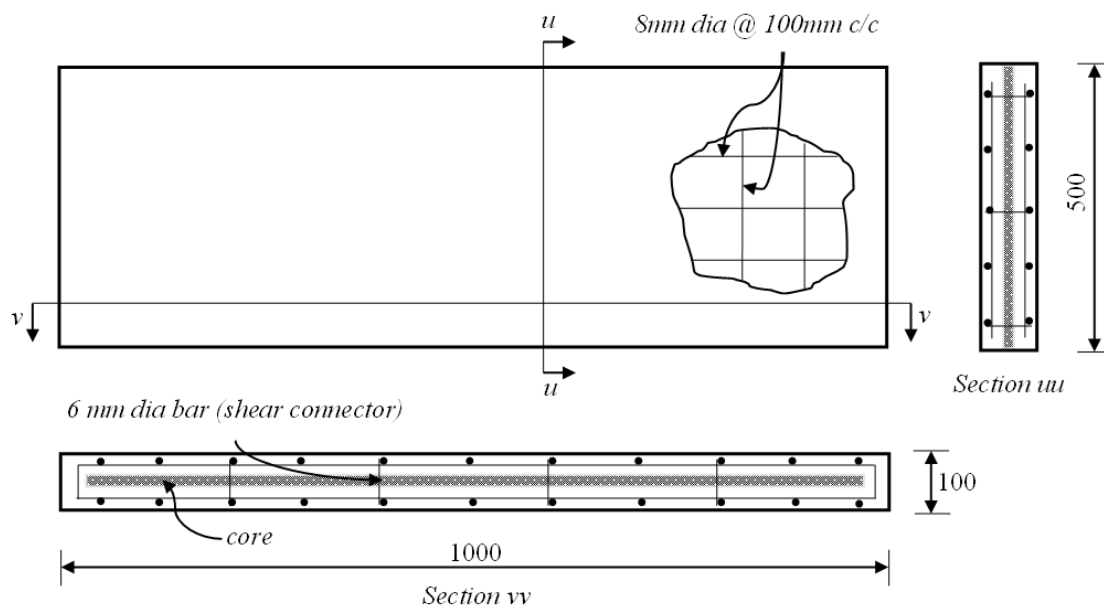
Geometric details of concrete sandwich panel (All dimensions are in mm)
